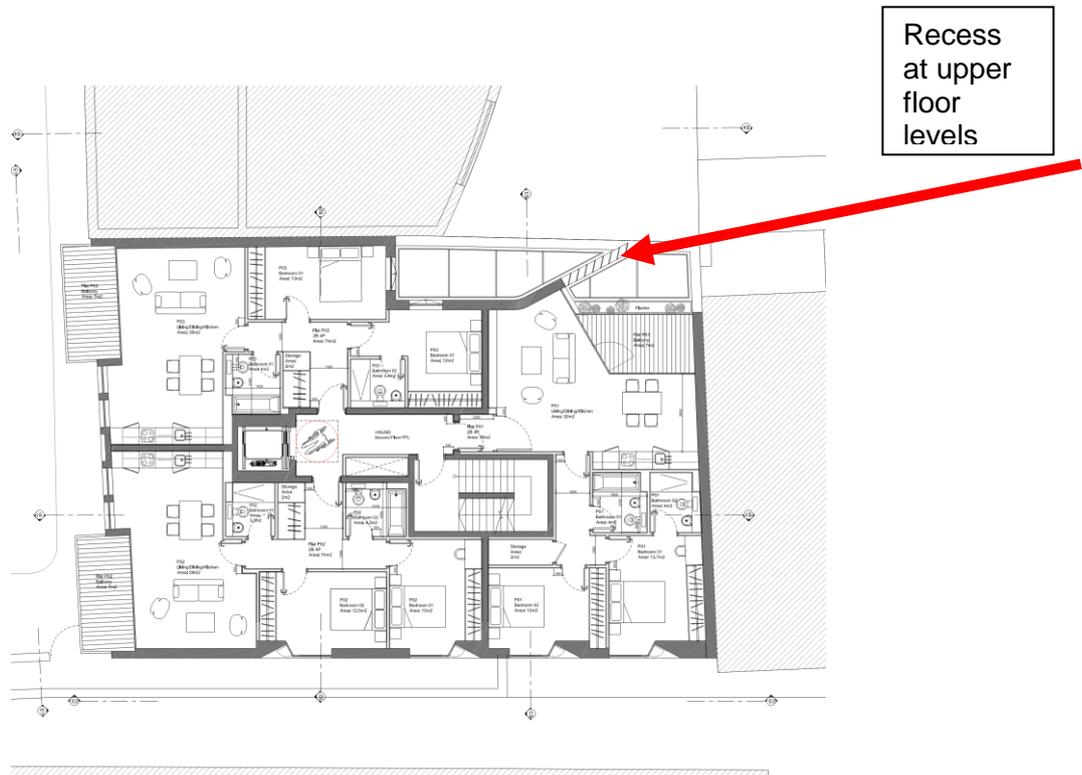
Proposed Second Floor Plan highlighting recess at the 2nd to 4th floor levels
